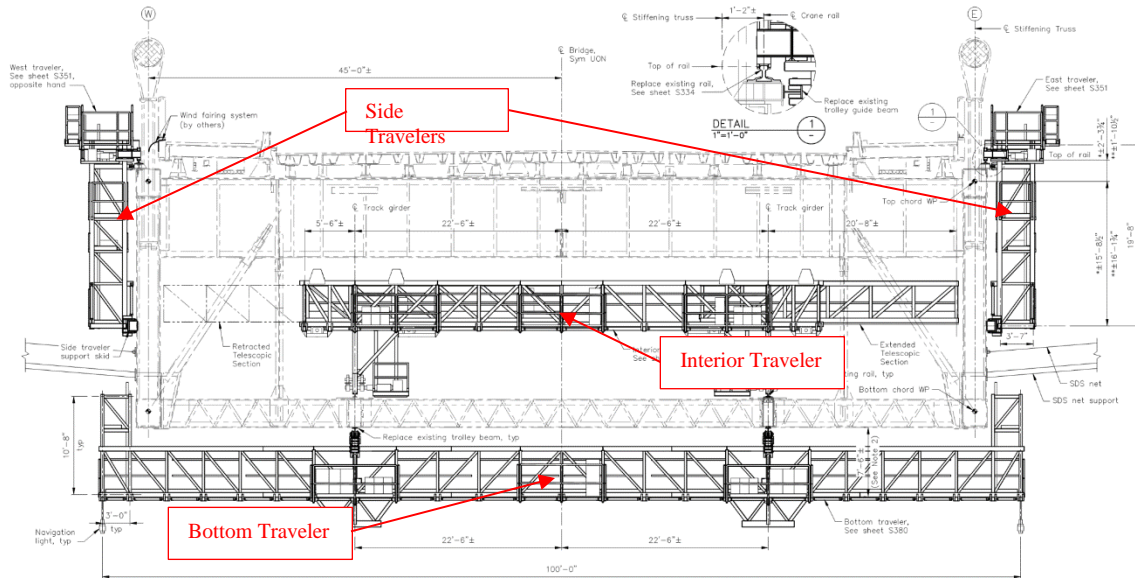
Plans of Suspension Bridge Proposed Travelers and Cantilevered Net Supports
